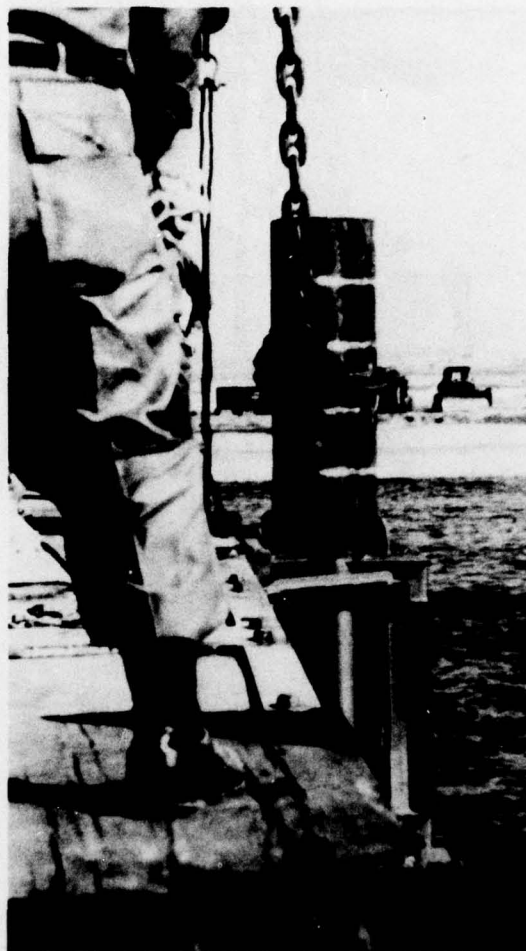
Pulling fender pile with truck crane during pier retrieval.
